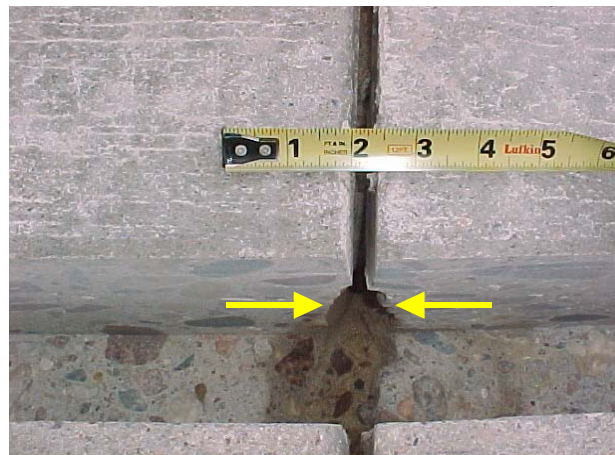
This view is a close-up of a joint and one DBR slot after diamond grinding.
